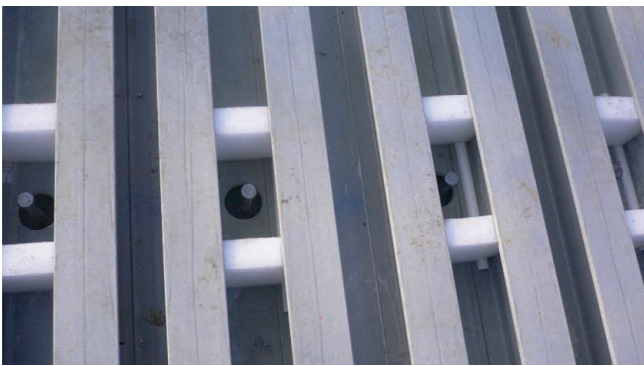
Shear Studs and Foam Dams for Grout Pockets
